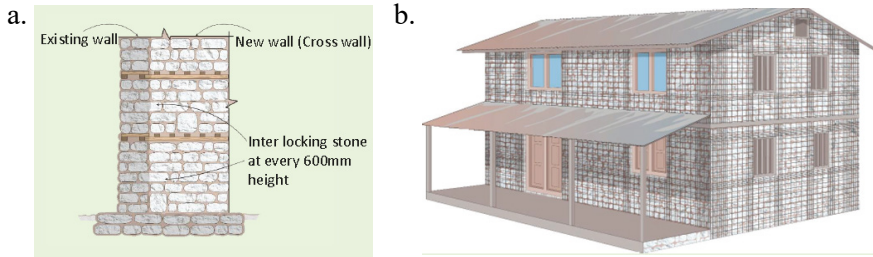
a. Detail of adding new wall b. Wire mesh jacketing application
